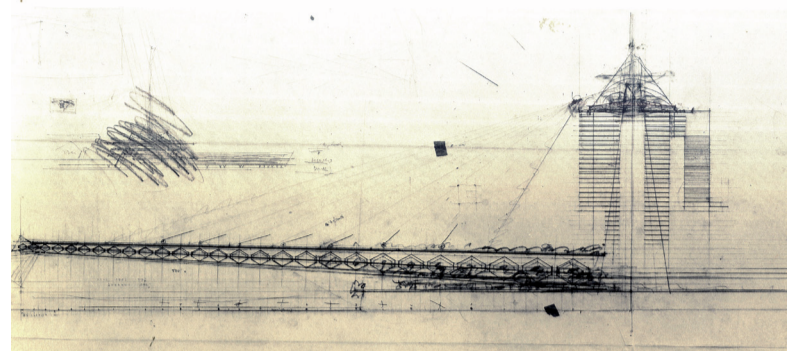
Side Elevation of Wright's Twin Suspension Bridges. 1948.
